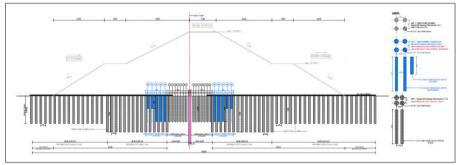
Section Detailing of DSM, Transition zone (DSM + Stone Columns) and stone columns for GAP I
